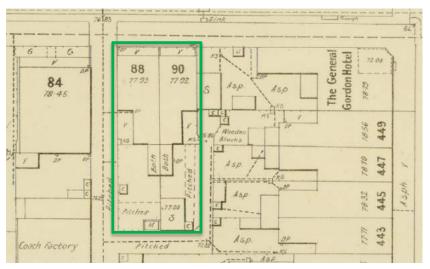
Site plan of the extant buildings at 88 and 90 Alexandra Parade in 1900 (MMBW Detail Plan 1211, dated 1900).
